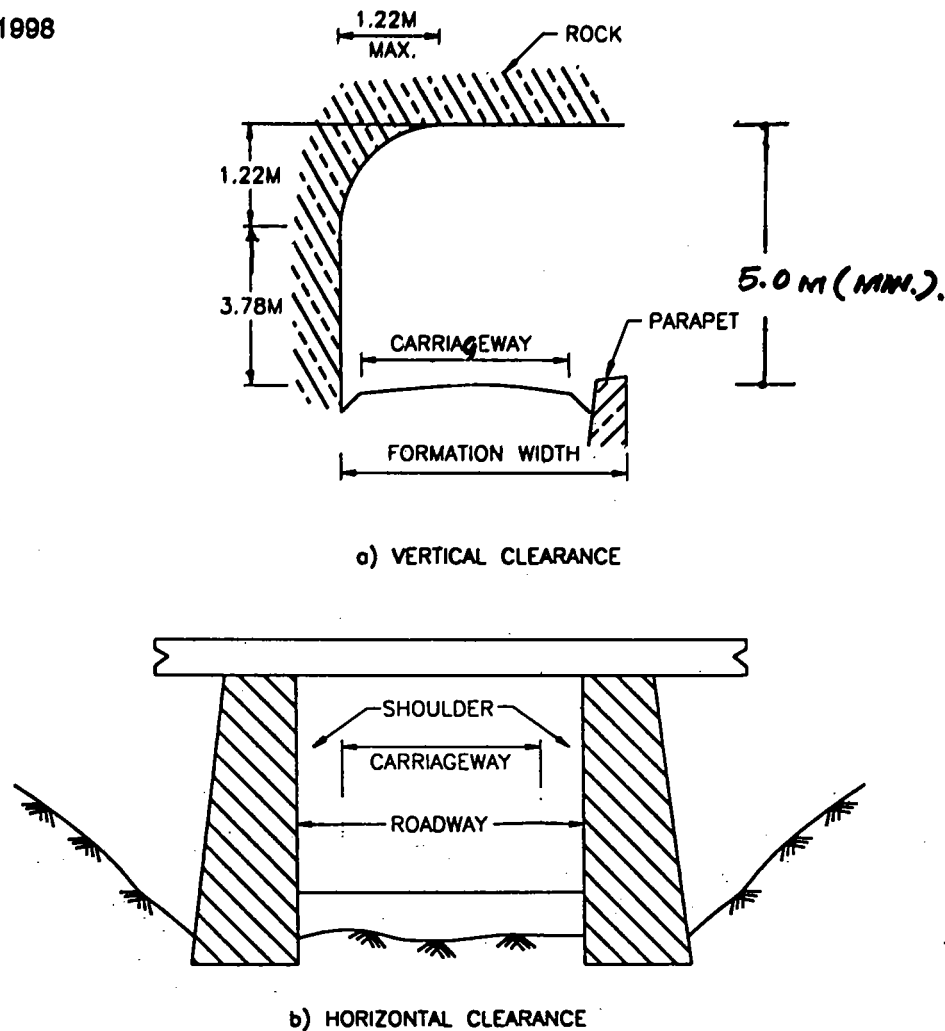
TYPICAL DETAILS OF VERTICAL/HORIZONTAL CLEARANCE
